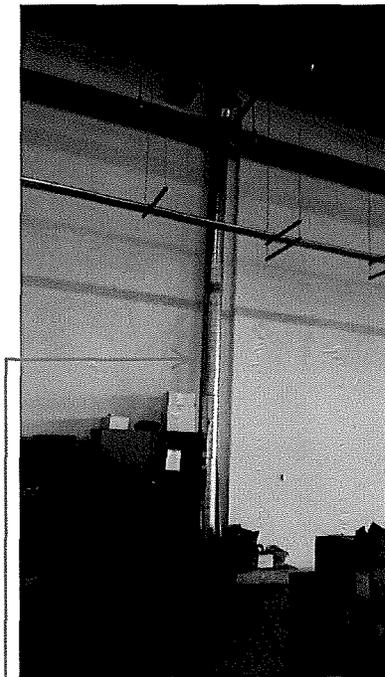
1207 Canal; typical warehouse space return air duct to roof air exchanger, column G9.
